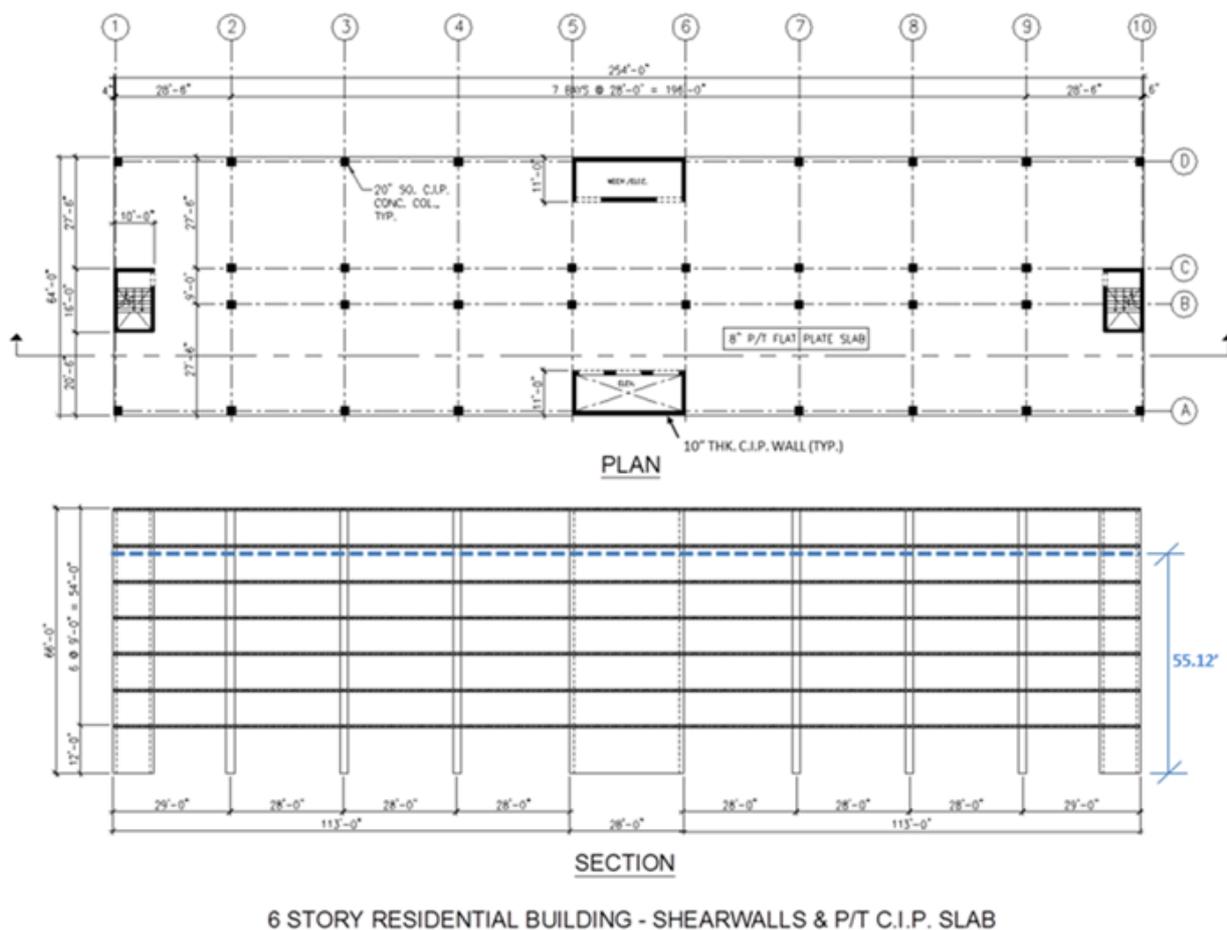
Plan and section views of the prototype 7-story residential building with reinforced concrete shear walls and posttensioned flat slabs supported on gravity columns. The indicated maximum flow depth is for the Hilo, Hawaii location.
